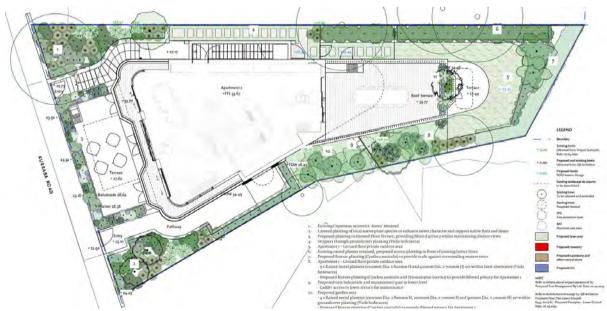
Proposed Landscape Site Plan, Page 3 dated 29 September 2023
